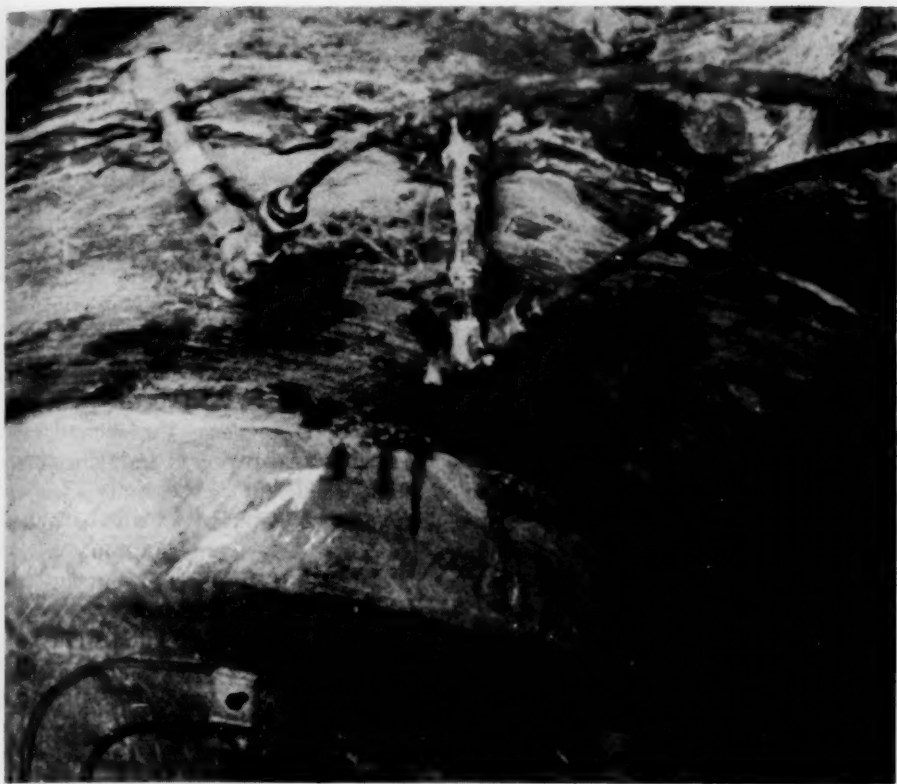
Chemical Sealing of Old Tunnel Lining—Hardened White Gel Along Ceiling Construction Joint, With Injectors Still in Place
